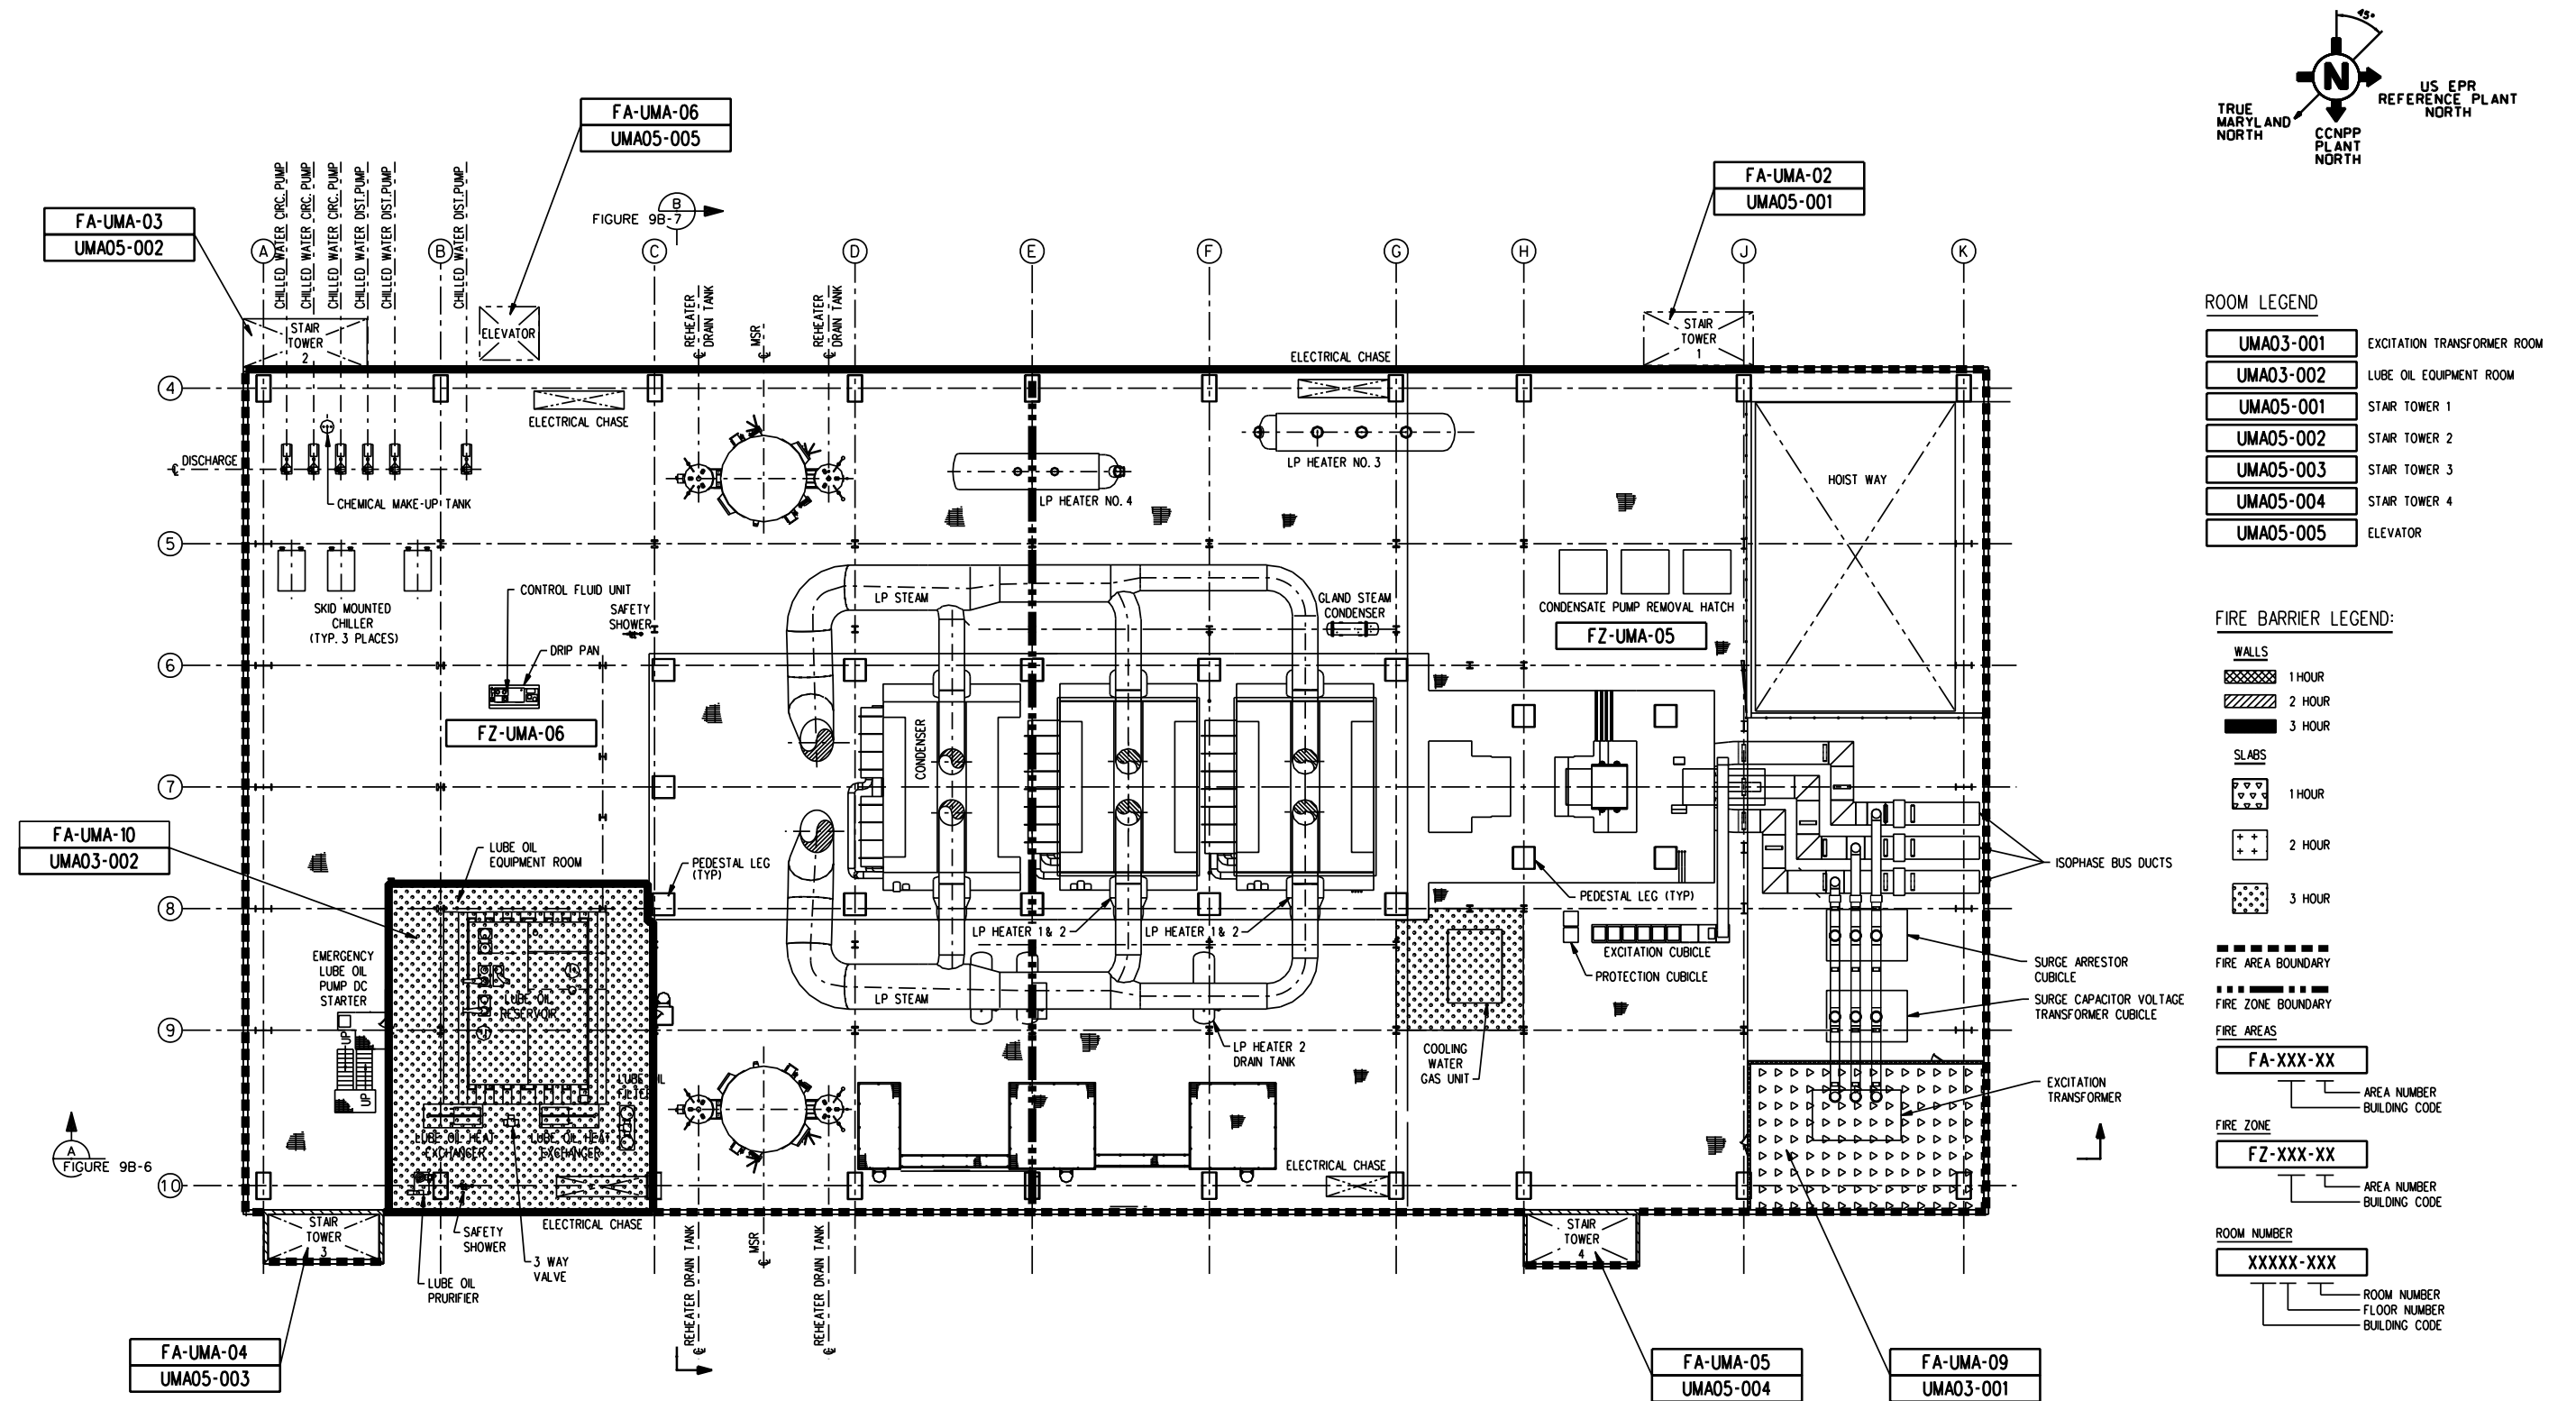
B-3 — CCNPP Unit 3 Fire Barrier Location, Turbine Building Plan at Elevation +33'-0" From Grade
